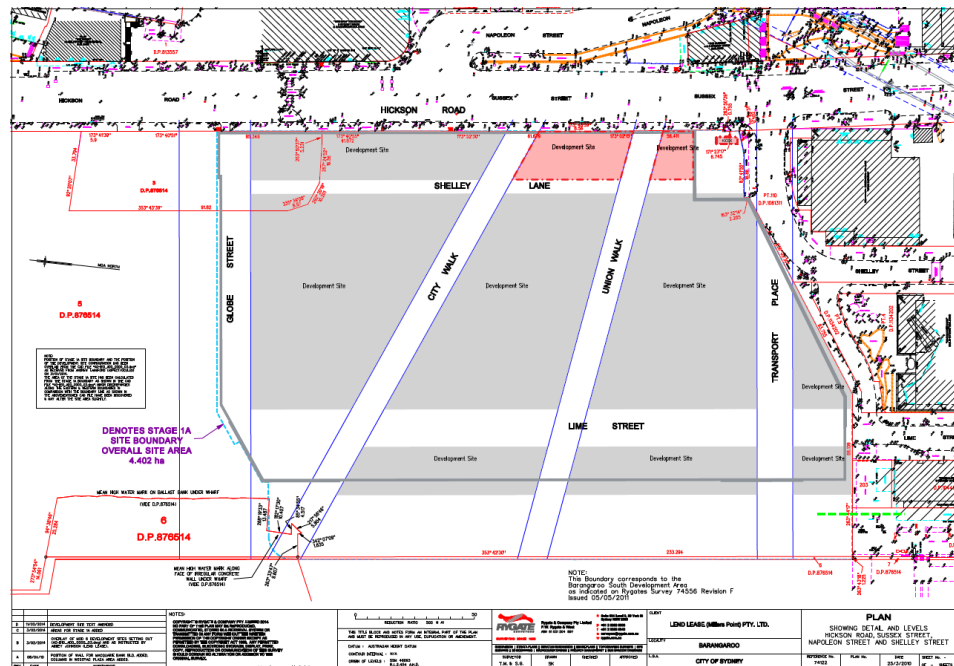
Extent of Basement Car Park Approval (grey line) and relationship to the Site (red line)
